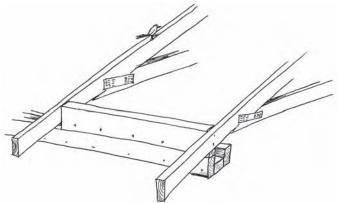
Securing the timber infill frame to the straw bale walls using 190×45 rafter blocks
